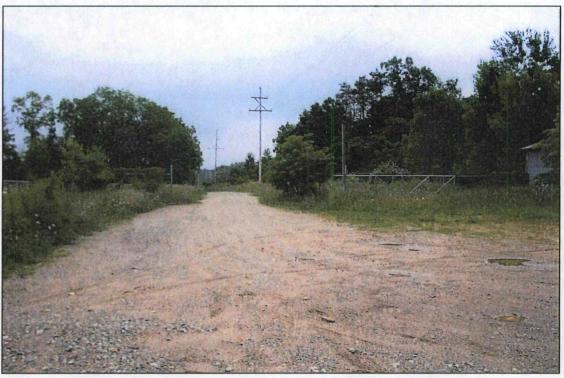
12th Street heading east between Landfill and Aggregate Industries Equipment Shop.
